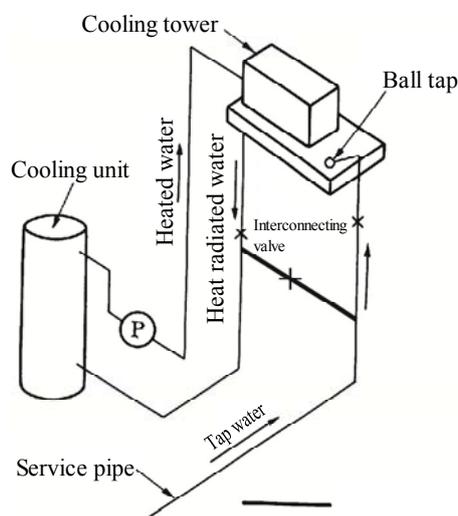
An example of facility to which connection of water service pipe not to be made
